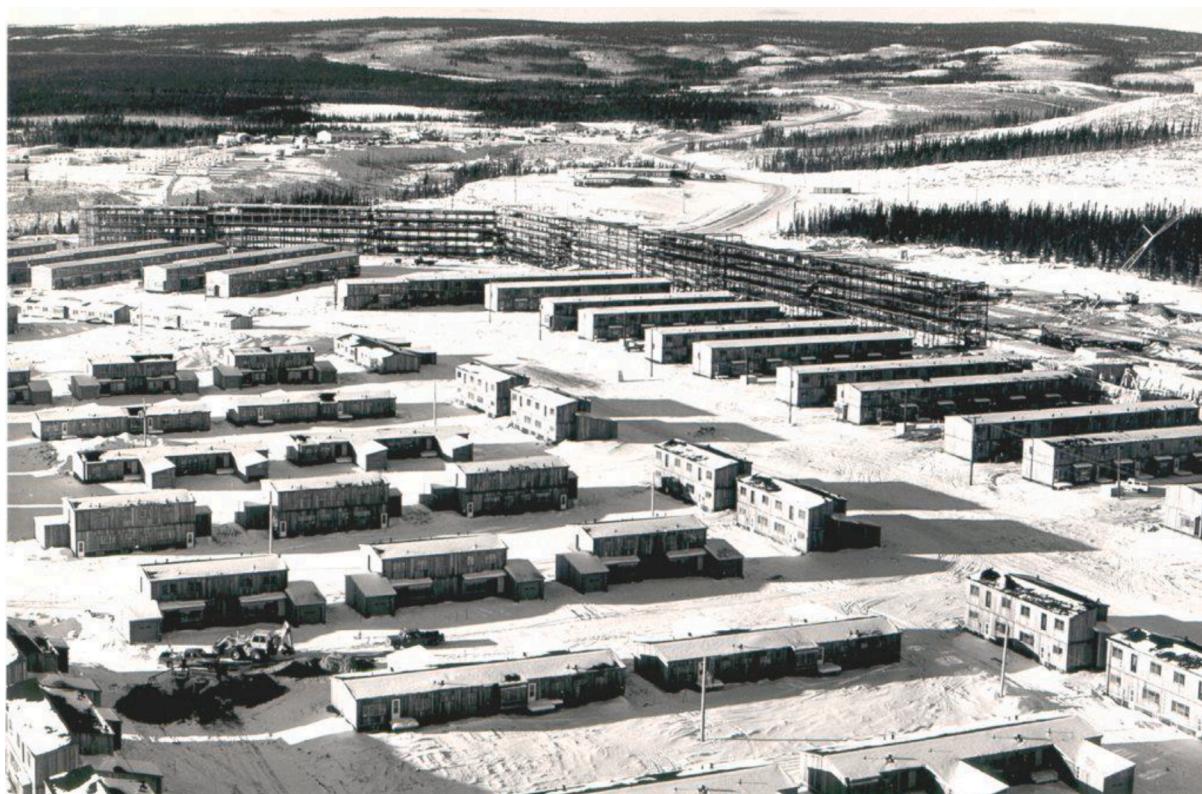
Construction of the Fermont Wall. Source: La Presse (archives, June, 17 1971) and Ville de Fermont.
